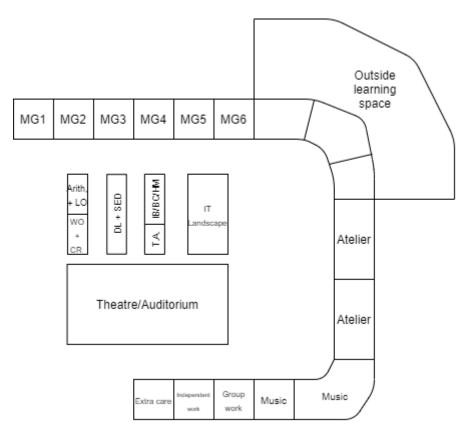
concept layout of the 'bovenbouw' in the new school building
